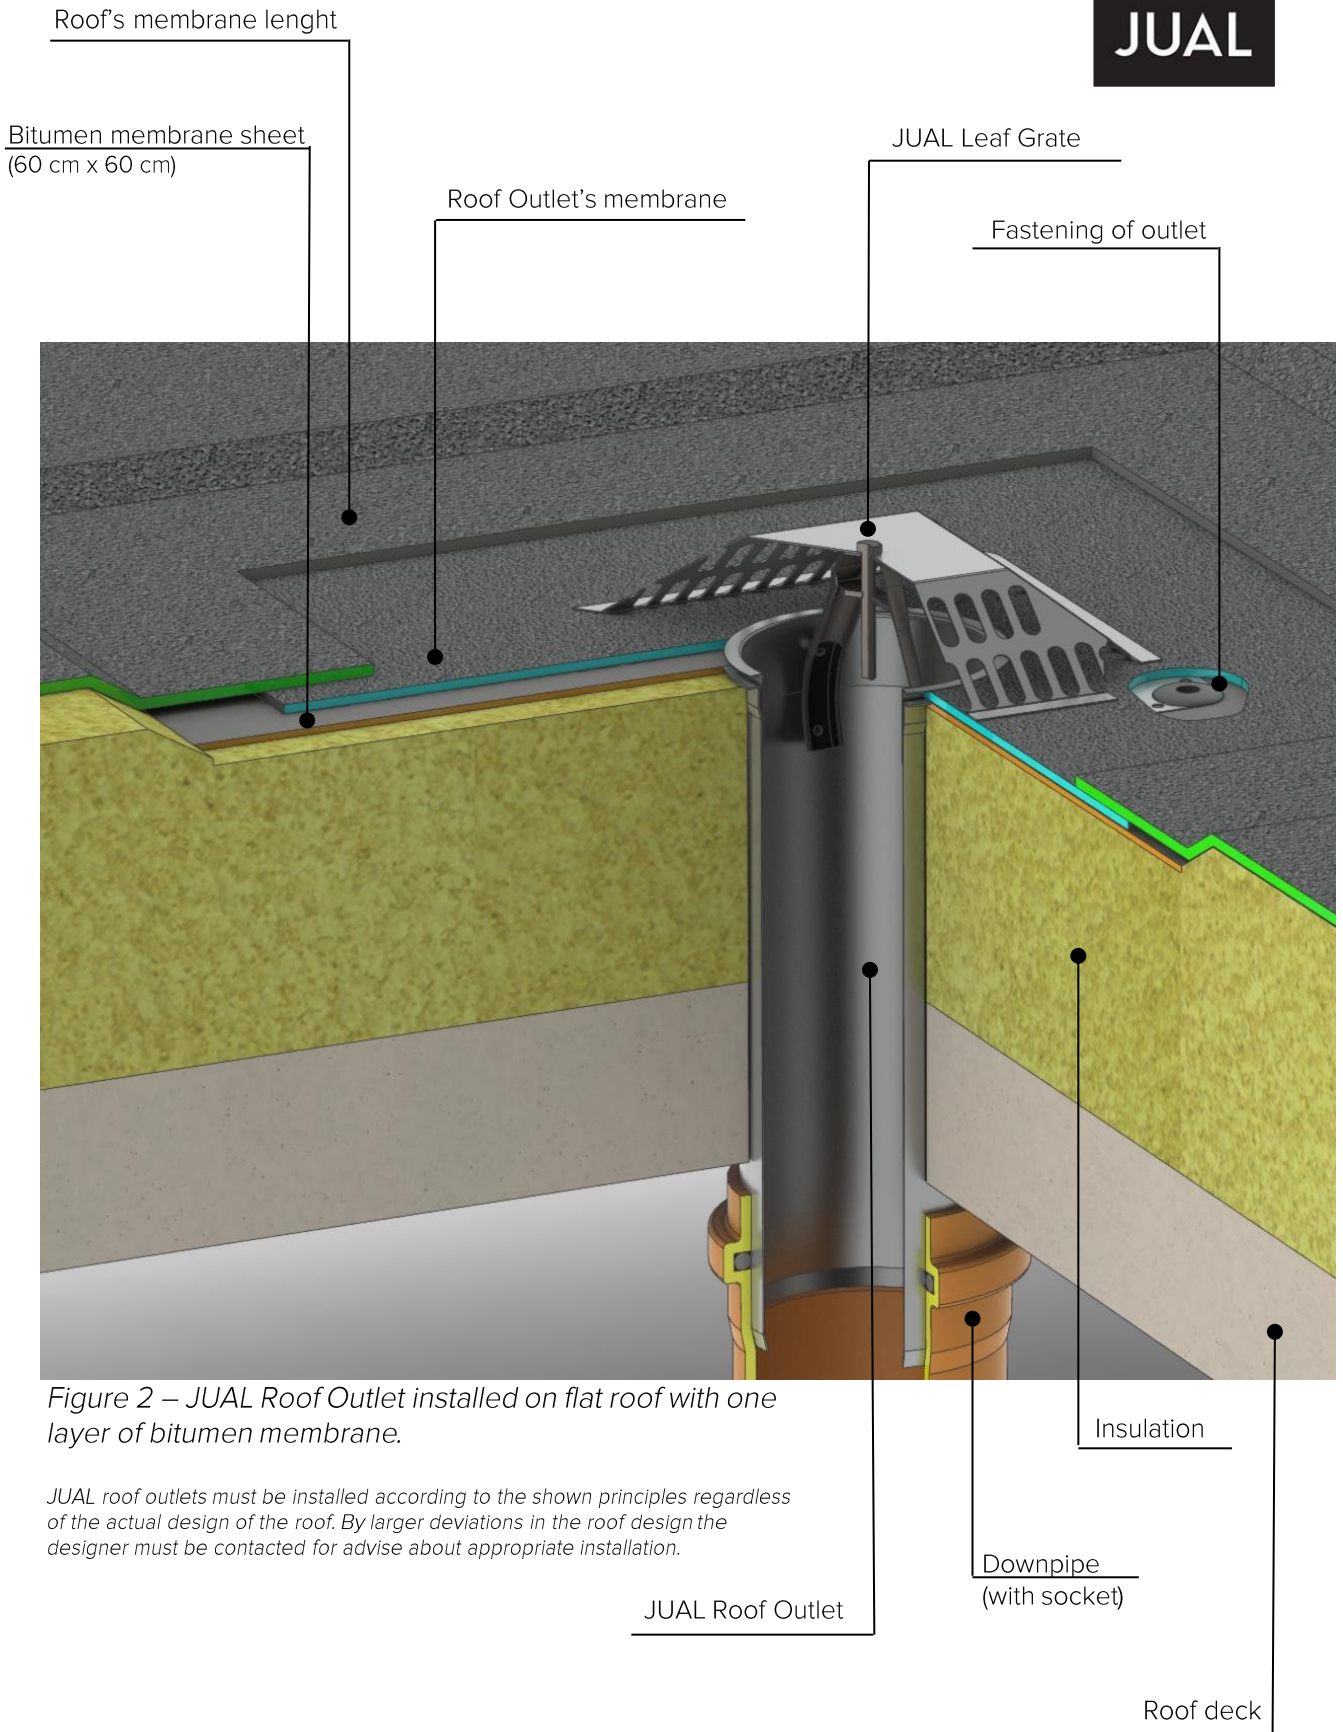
JUAL Roof Outlet installed on flat roof with one layer of bitumen membrane.
